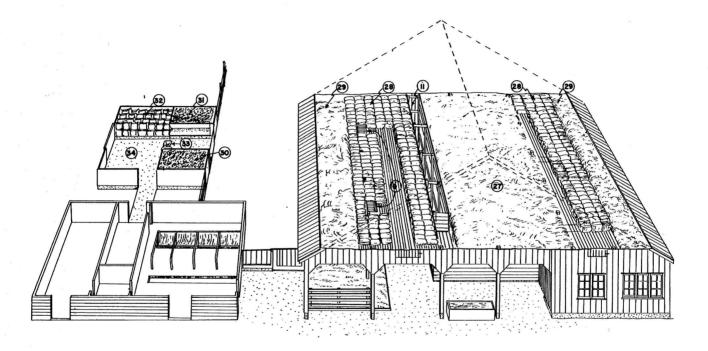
Feed storage and handling in buildings shown in Figure 4. 9—Bedding chutes; 11—hay feeding manger; 27—hay storage; 28—bedding storage; 29—straw loft; 30—corn; 31—oats; 32—supplements; 33—grinder; 34—mixing floor.
